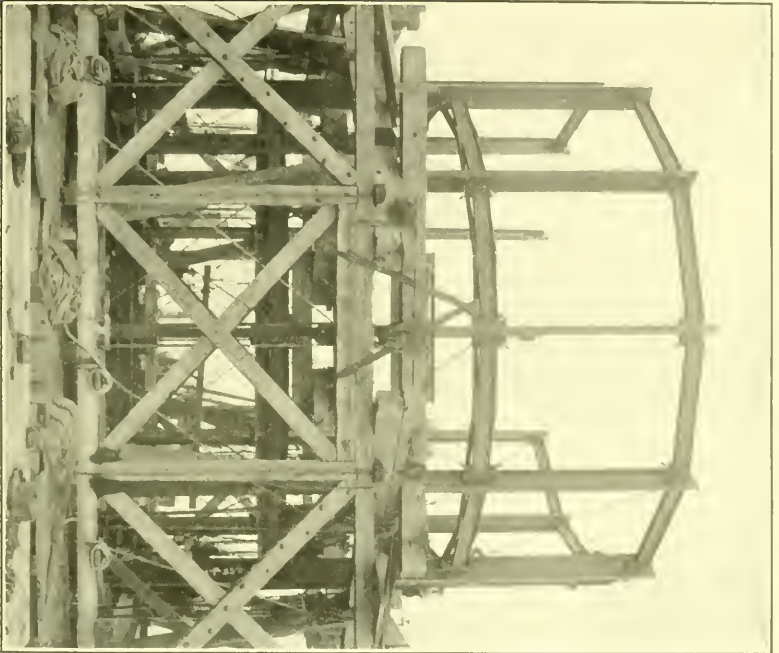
ERECTION OF GUIDE-FRAME FOR PIVOT PIER CASING,
